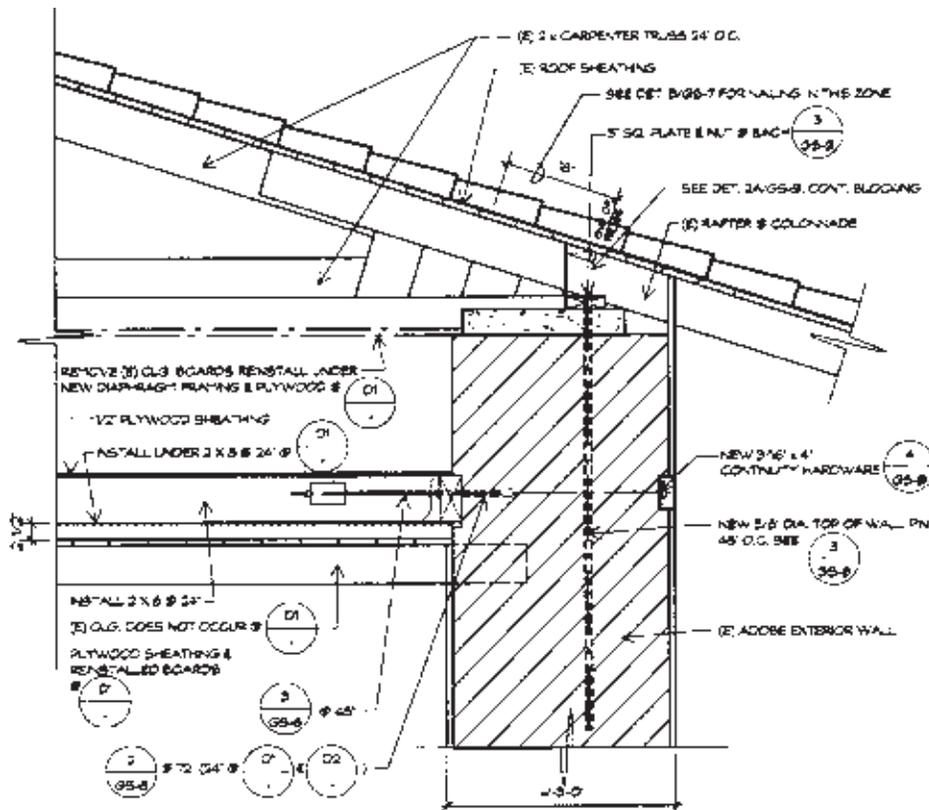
Typical top-of-wall stability-based measures for the Mission San Miguel gift shop.
